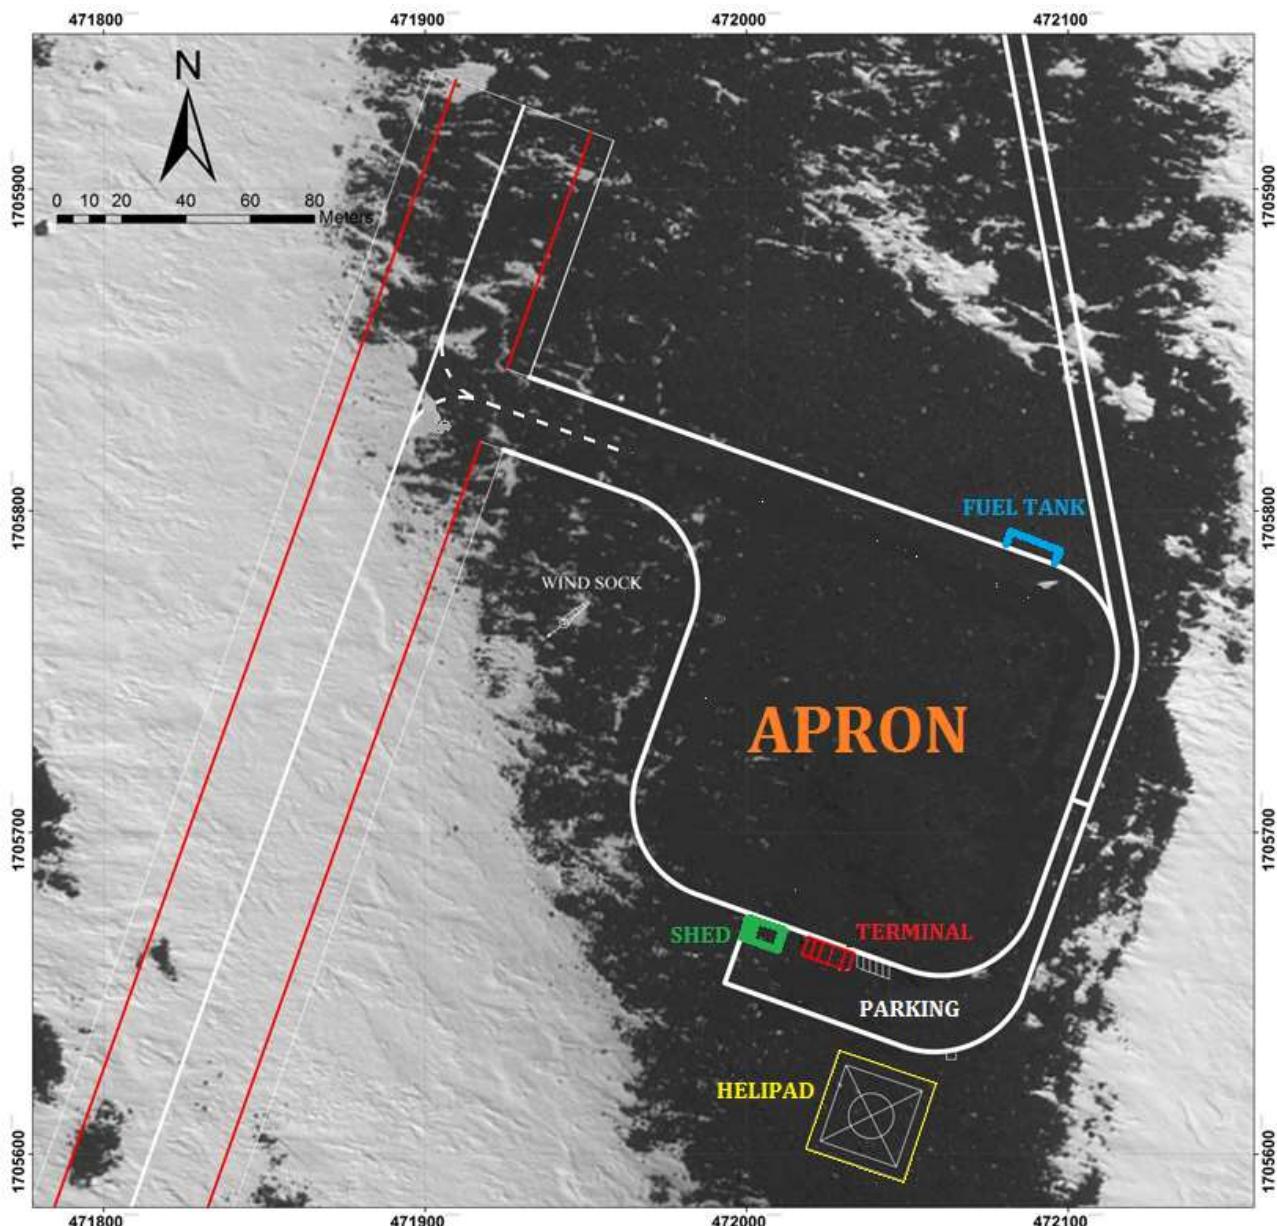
Runway facilities: Apron, taxiways, fuel tank, helipad, and vehicle access road.
